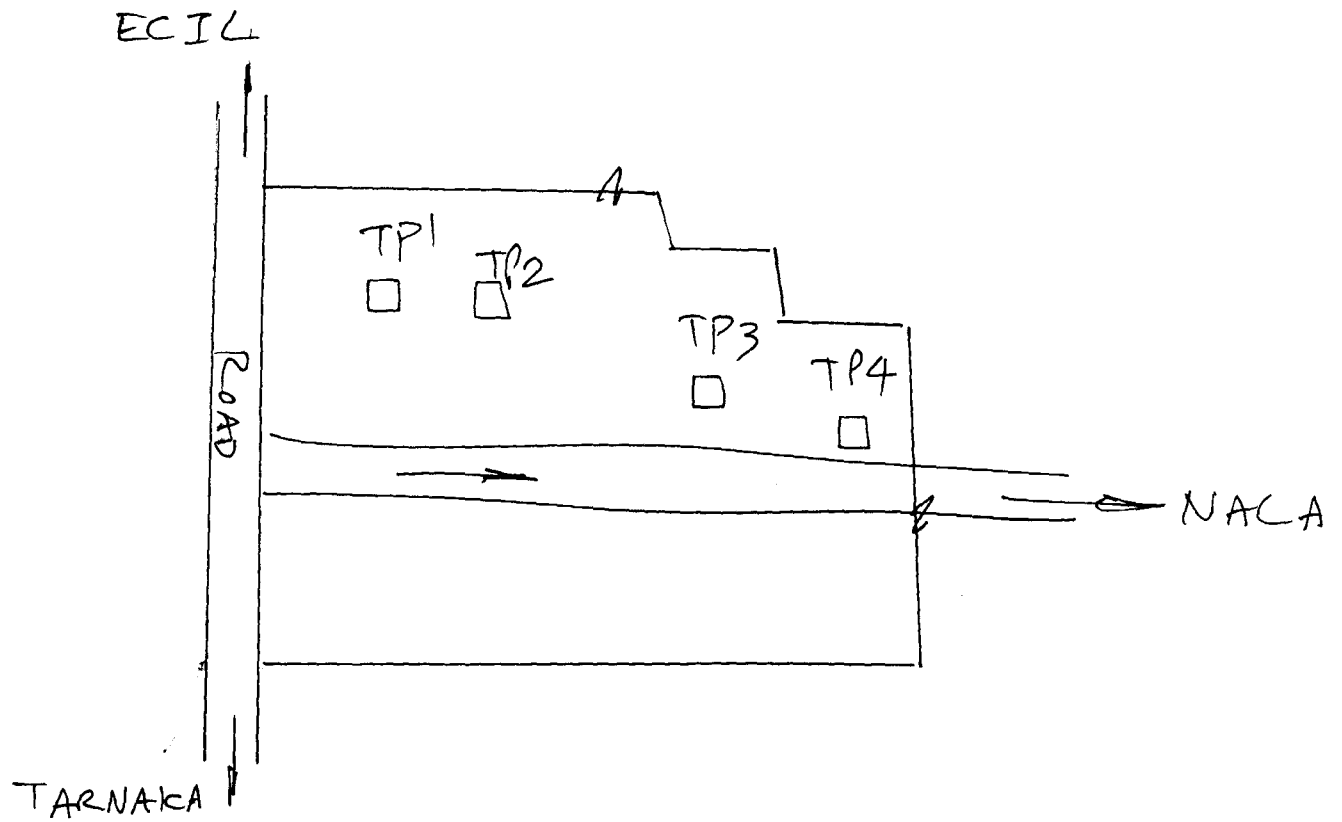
SITE PLAN OF PROPOSED BUILDINGS
